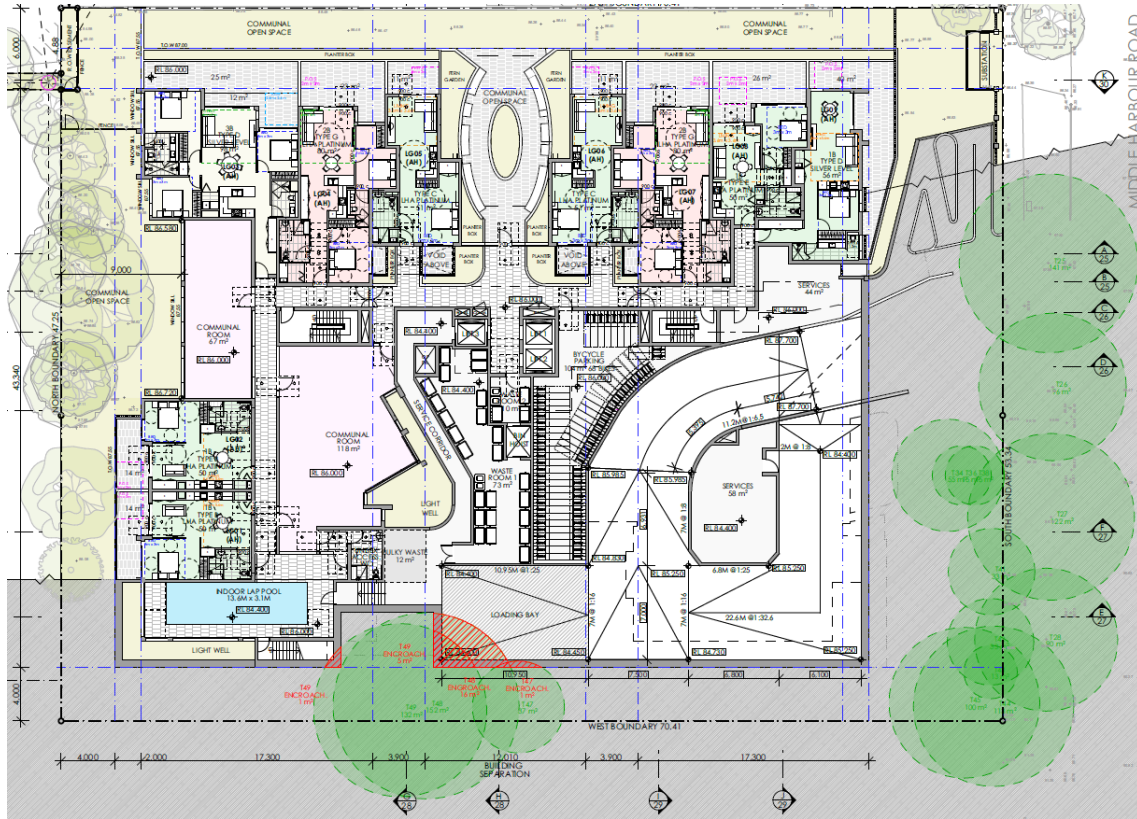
Lower ground floor plan (Source: PTI Architecture)
